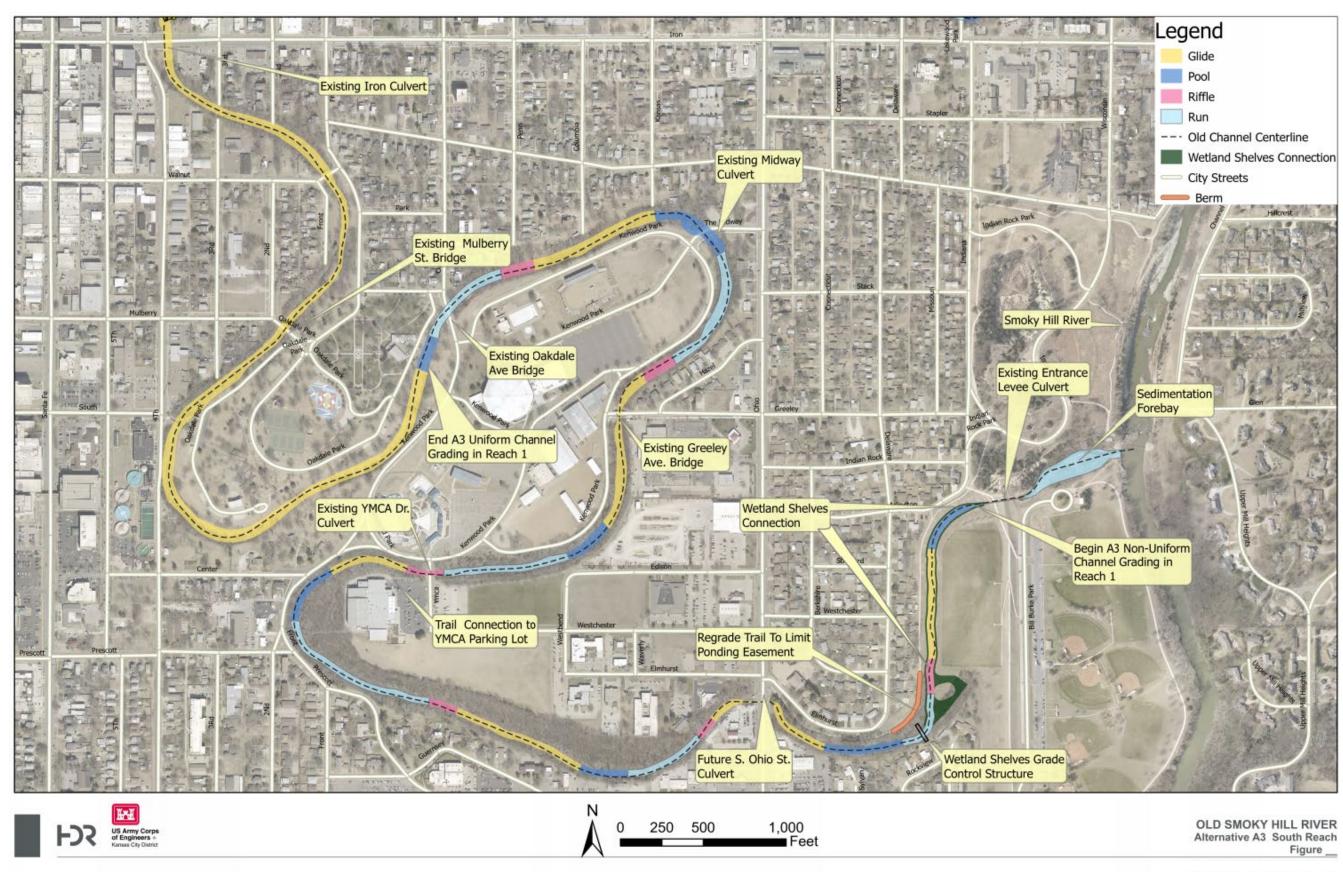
Alternative A3 Non-Uniform Channel Grading Plan View Layout (Reach 1)
